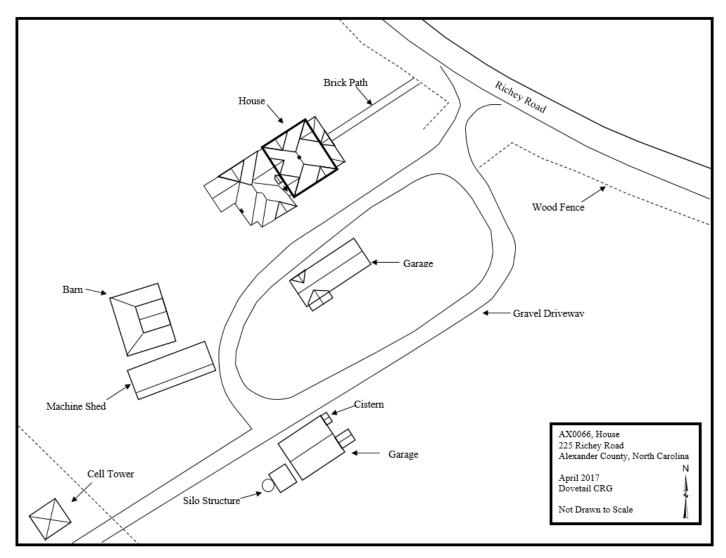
Site Plan for the House at 225 Richey Road (AX0067).
